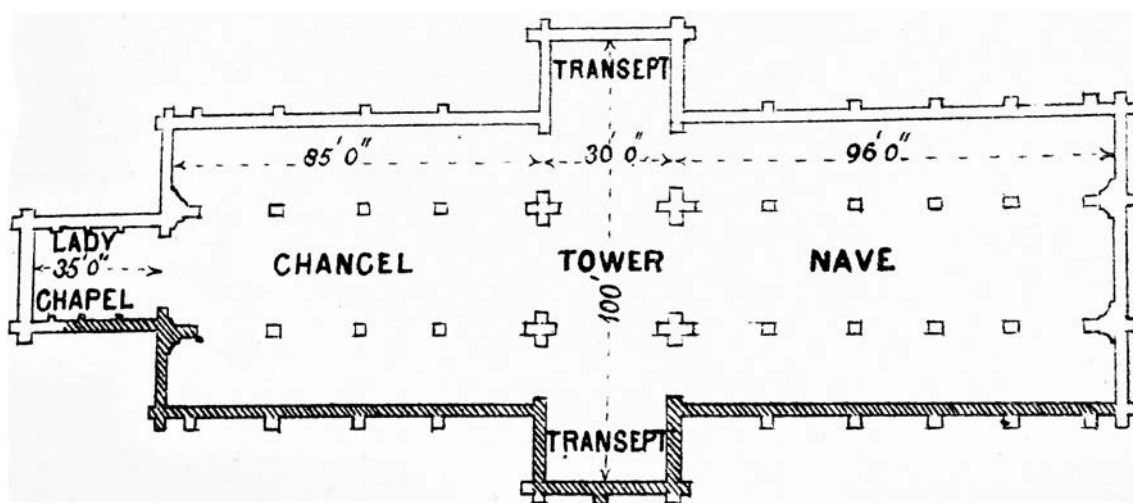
Plan of the former church at Glasney published by C R Sowell (1865). North is to the bottom. The shaded walling could be ‘traced somewhat accurately’ at the time Sowell made his plan.
